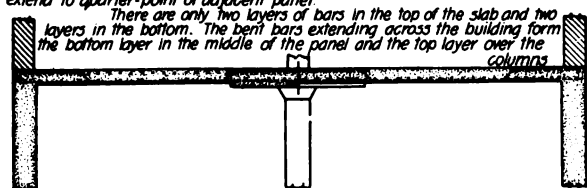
DIAGRAM SHOWING ARRANGEMENT OF REINFORCEMENT.
